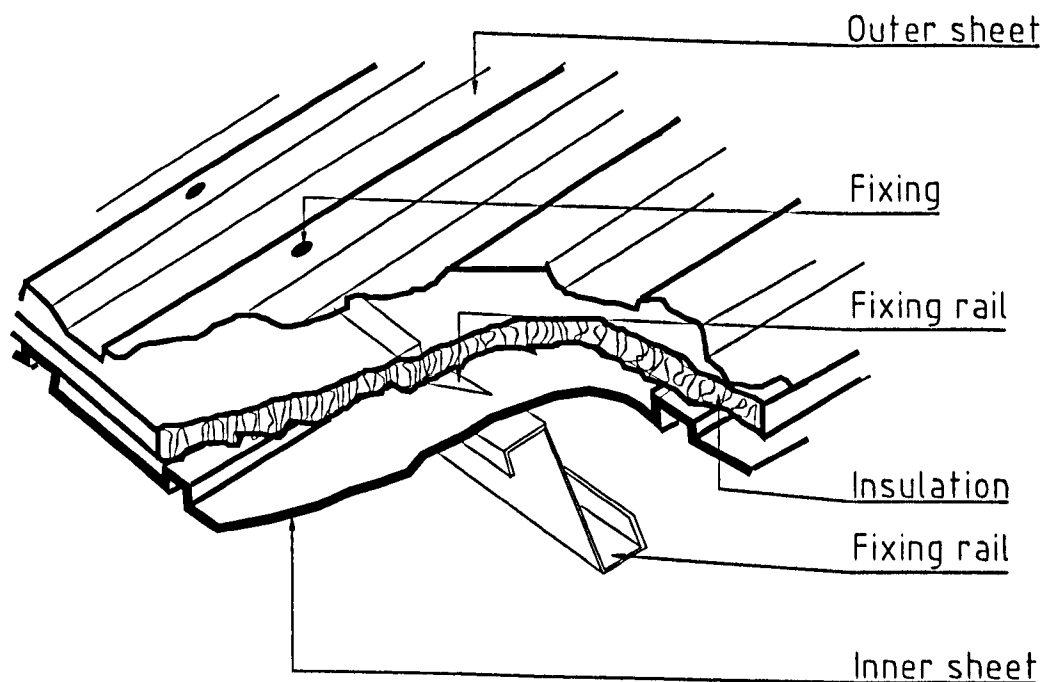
Foamed panel system (Source: Development of PV Cladding System ETSU 1996)
